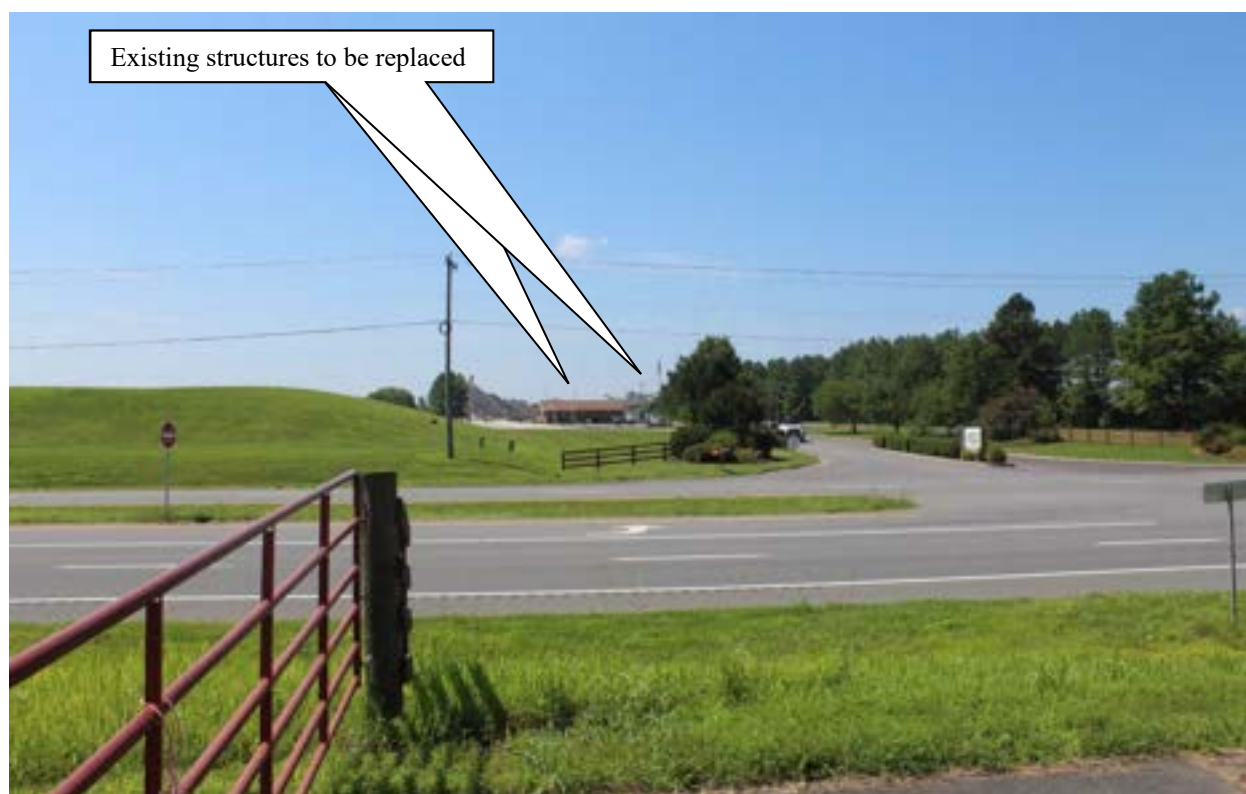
Photo location 16- View from Route 3 at eastern edge of district (Multiple existing project structures visible), facing south.
